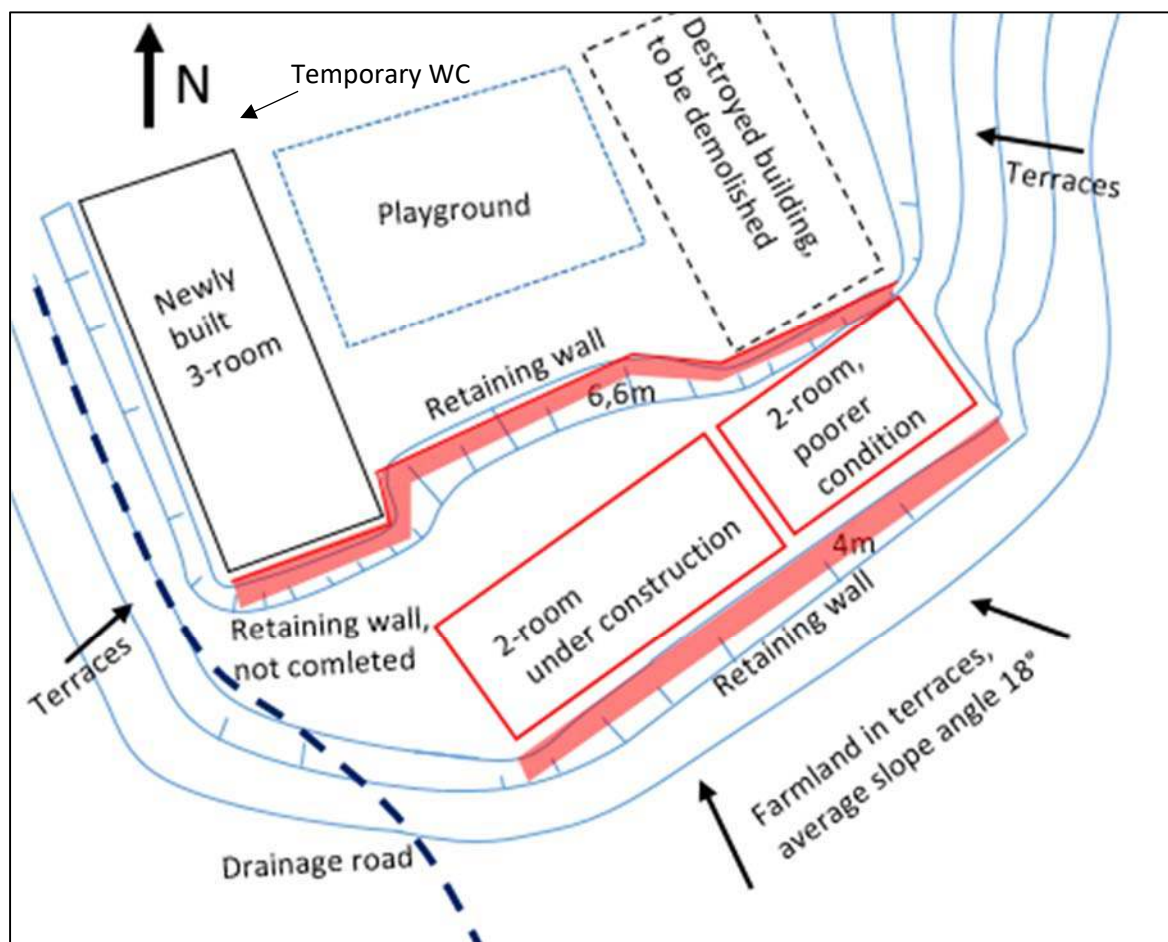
Plan view – Mahadesewori school. There is a height difference of 6,6 meters between the upper (southern) and the lower (northern) plateau. A retaining wall between the two plateaus should be constructed, also a railing for safety. The retaining wall close to the newly constructed 3-room building should be completed. Note: The drawing cannot be considered correct in terms of scale, it is based mainly on field observations.
